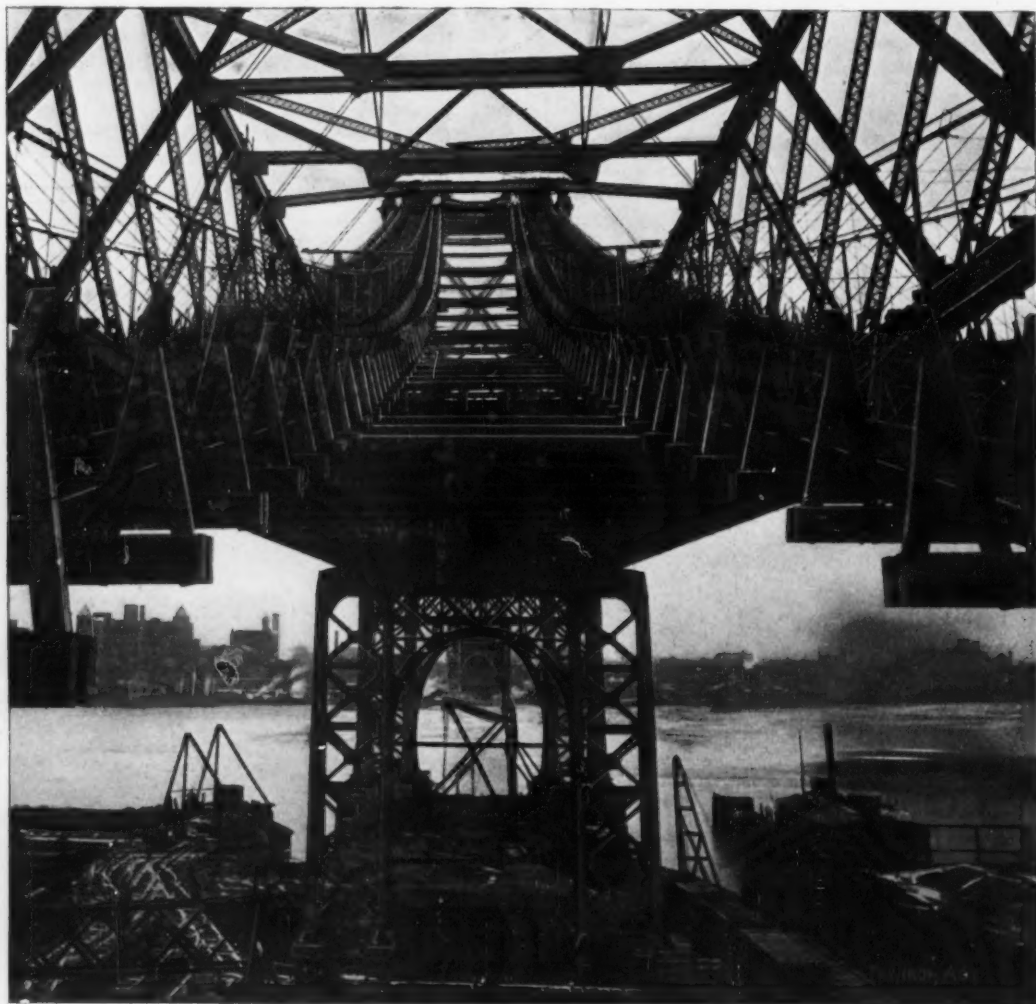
Looking Toward the Brooklyn through the New York Tower.
